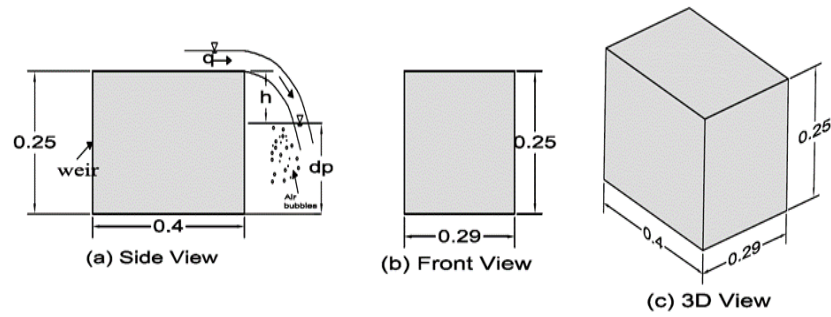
A broad crest weir: (a) Side view, (b) Front view, and (c) 3D view
